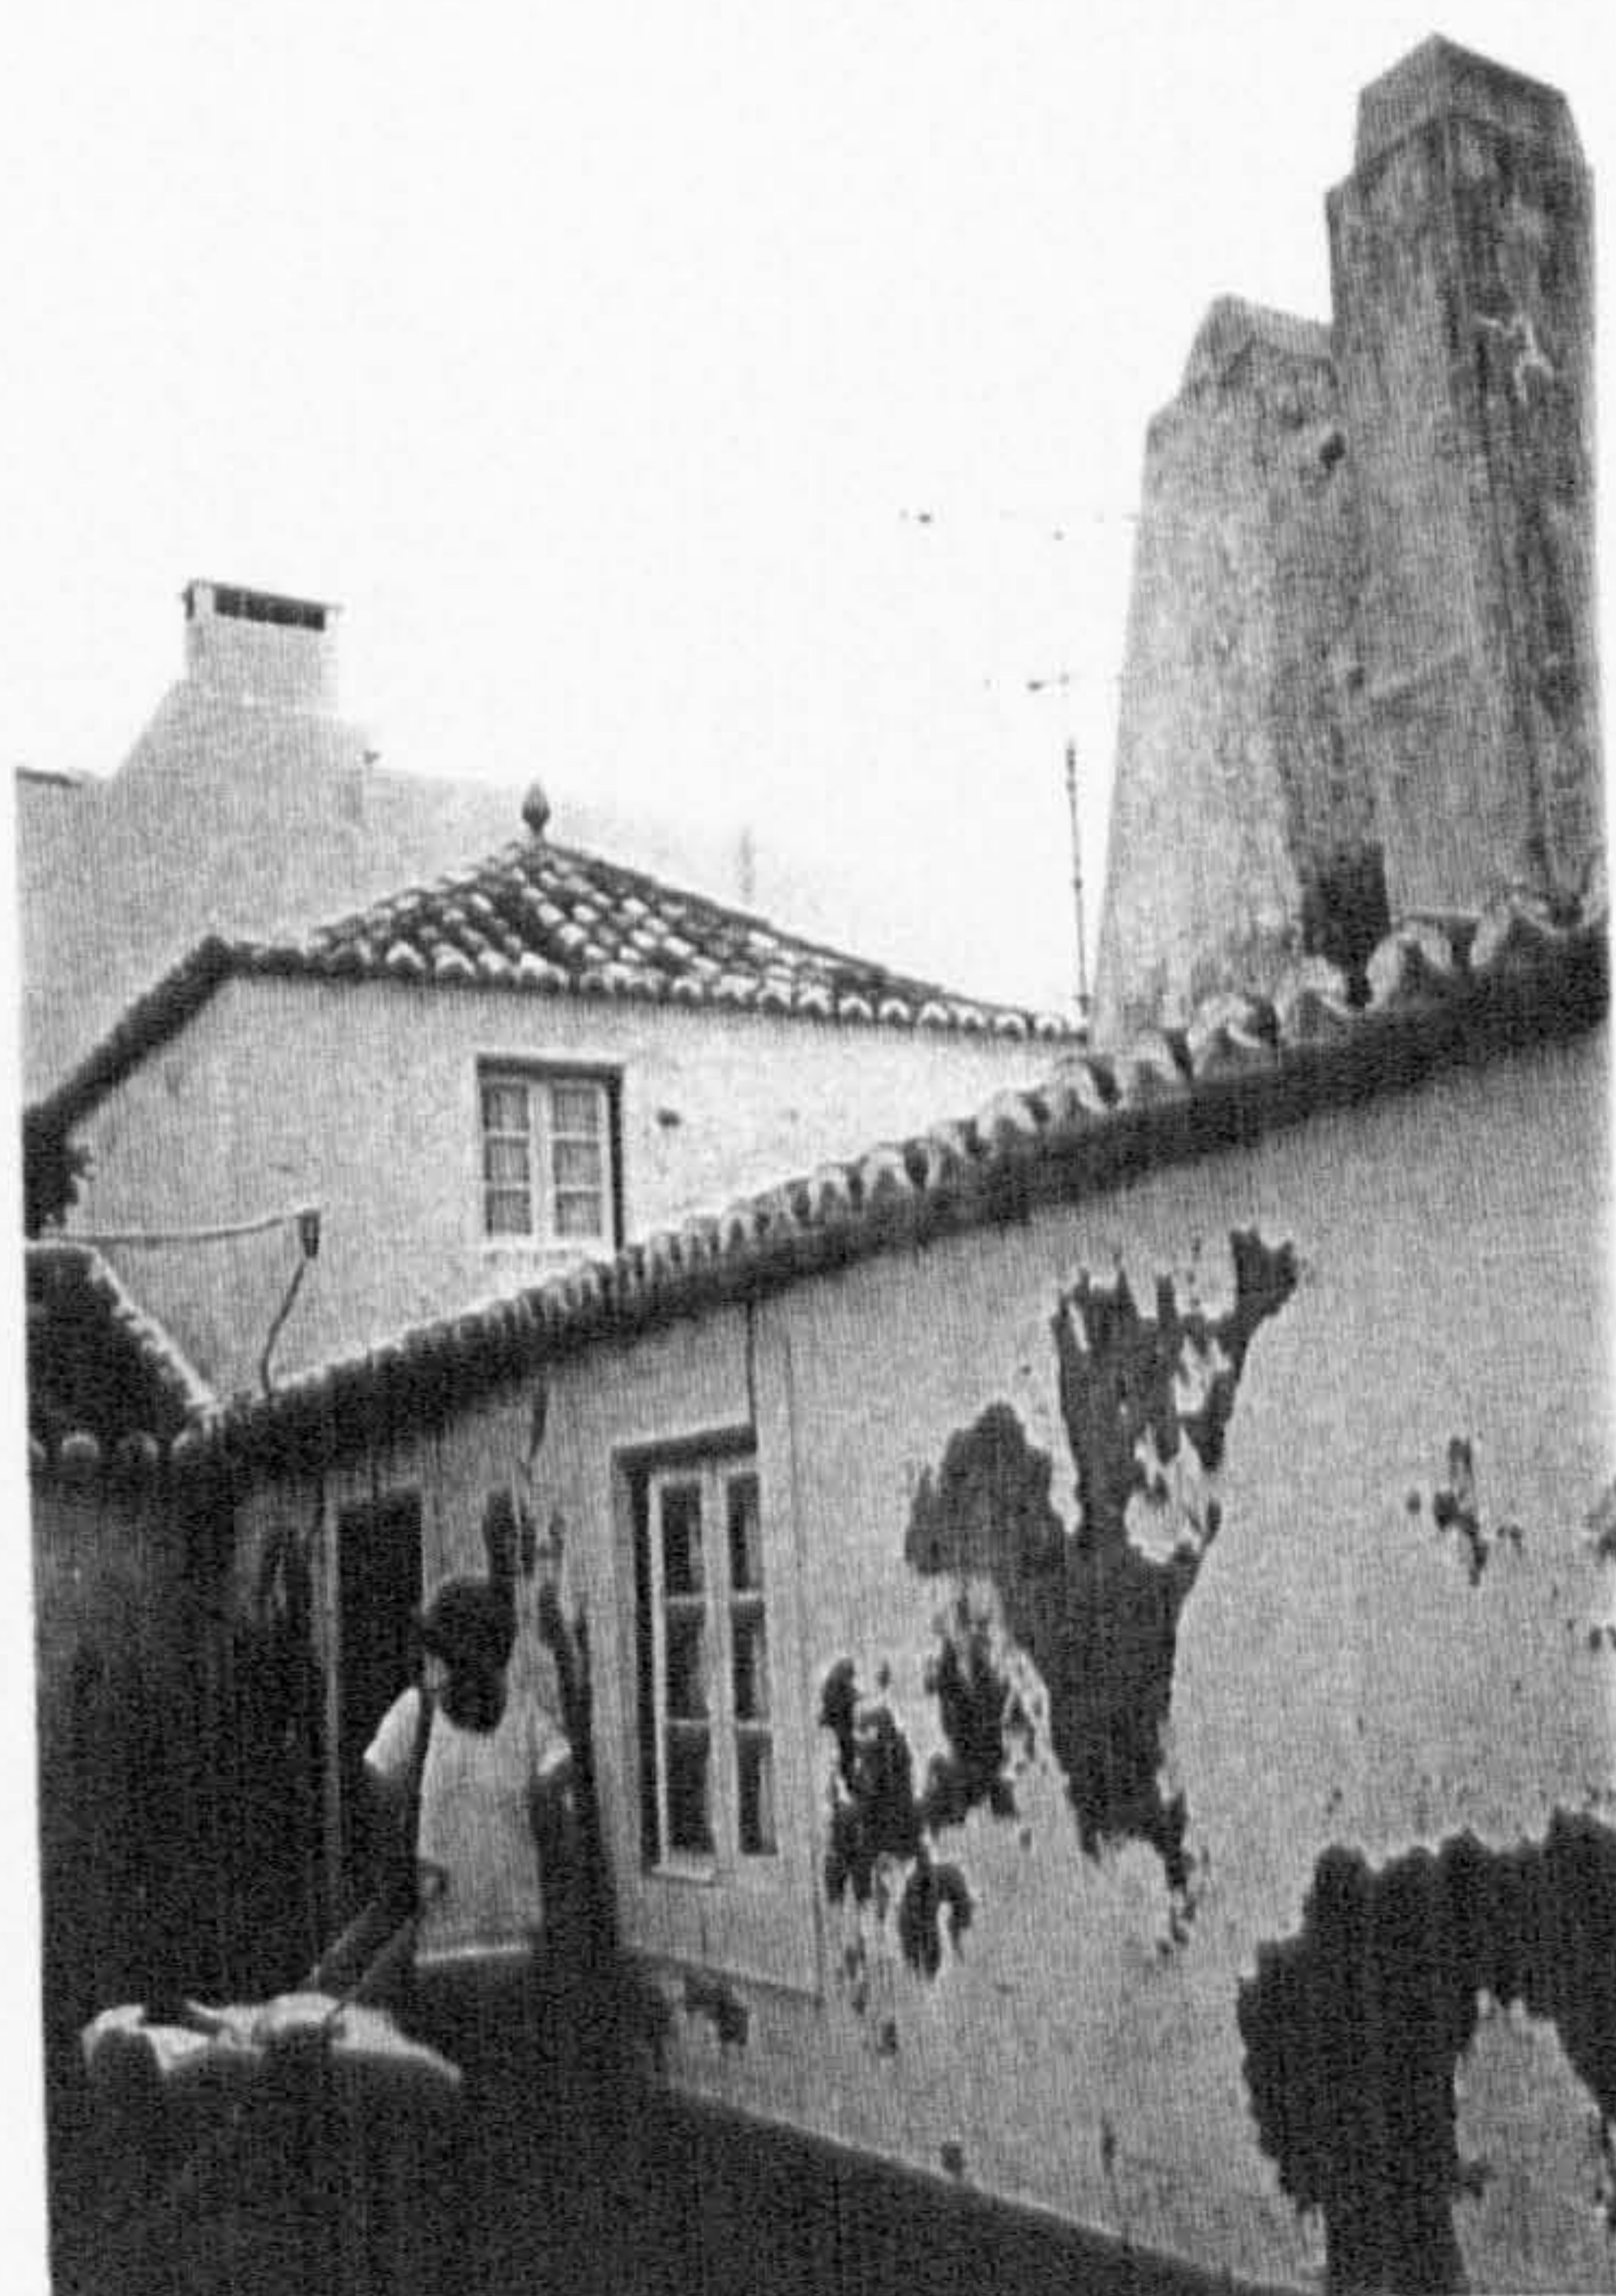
Ground floor house, the structure of the triangular roof.
